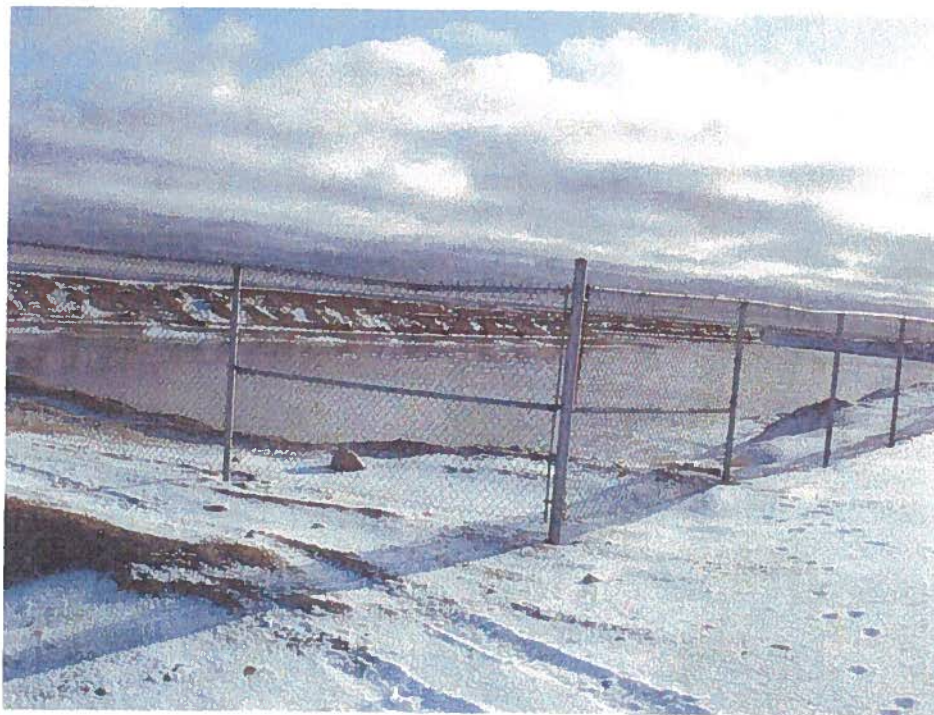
Lagoon No. 1: Looking east towards Solid Waste Dump.
